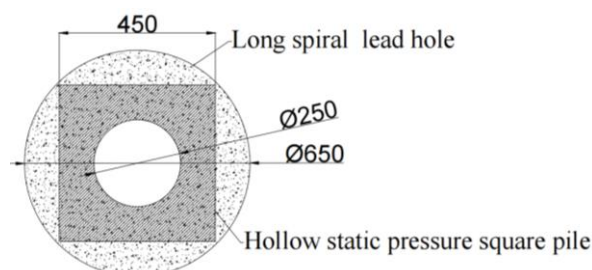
Cross-sectional drawing of long spiral guiding-hole static pressure pile
